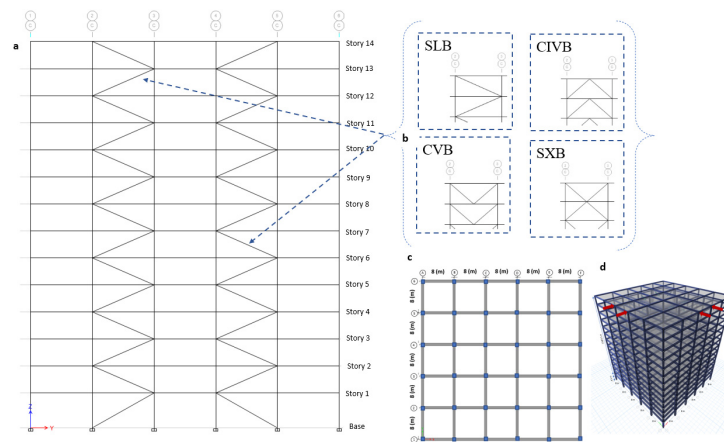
(a) elevation view, (b) Structural models with Single-Leg Braces (SLB), Chevron Inverted V Braces (CIVB), Chevron V Braces (CVB) and Split X braces (SXB), (c) the column layout plan and (d) 3-D view of the building.
